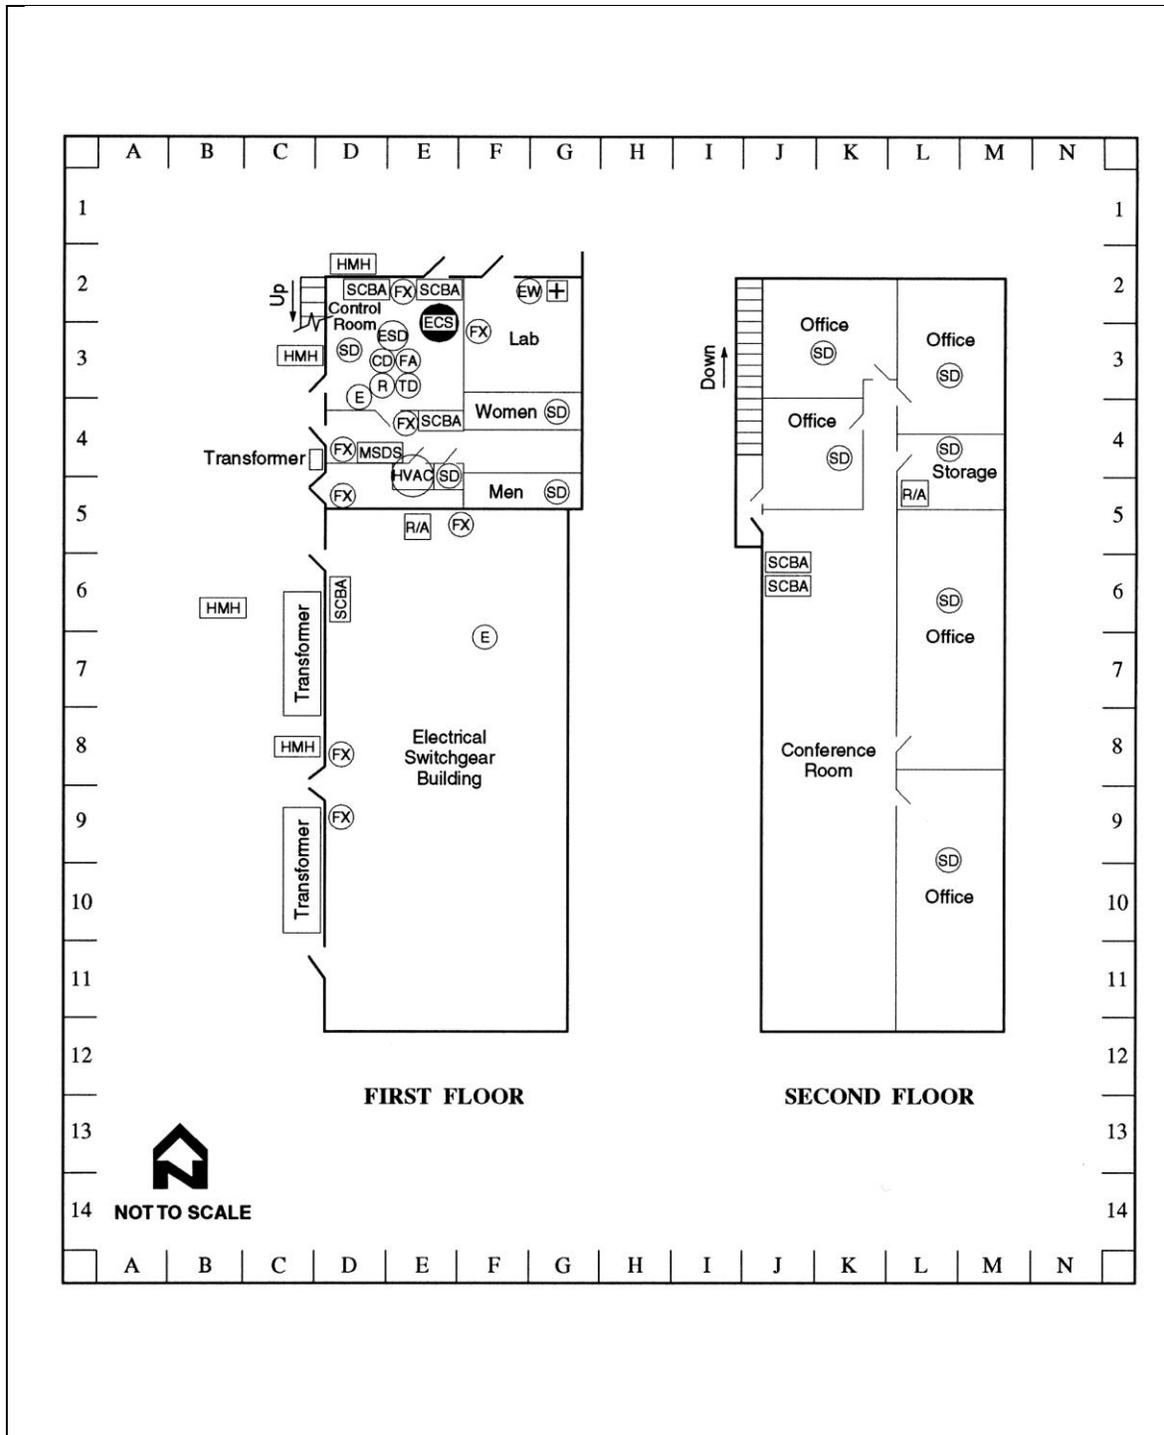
Ellwood Onshore Facility Office / Control Building Detail
